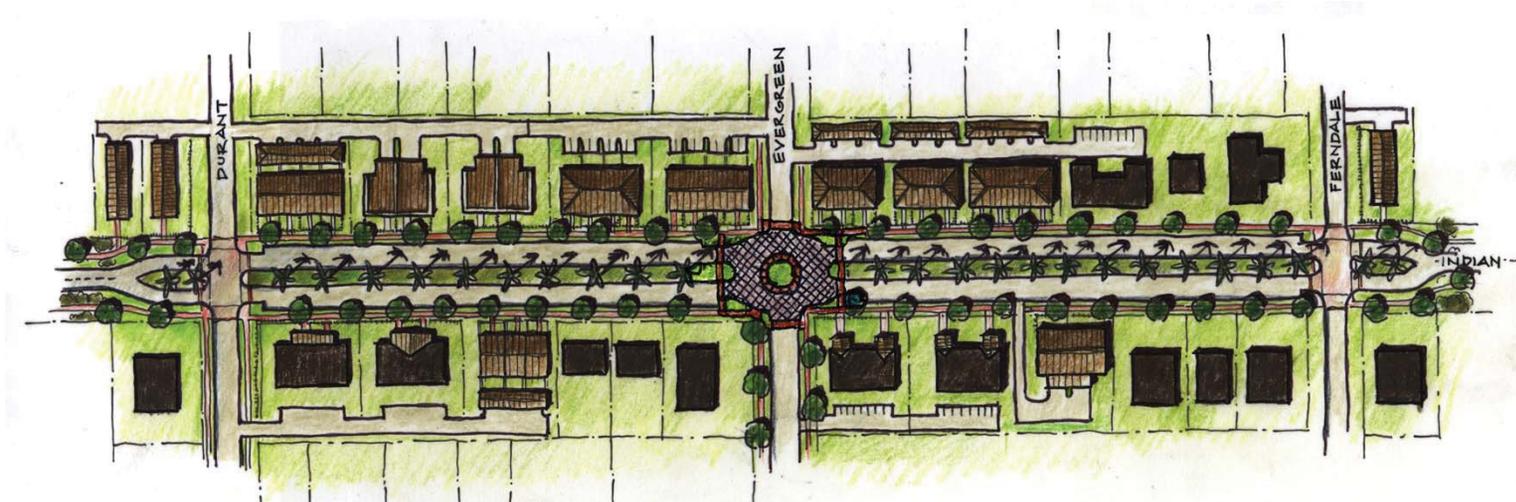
Plan of Indian Street Improvements at Evergreen
